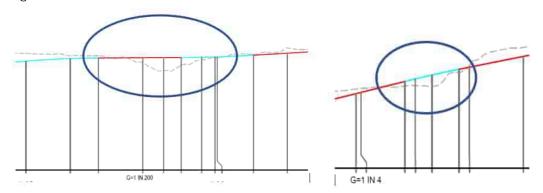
Instances of Road Level above Surrounding Ground Level- Road 1 Left, ROW 3 Right
